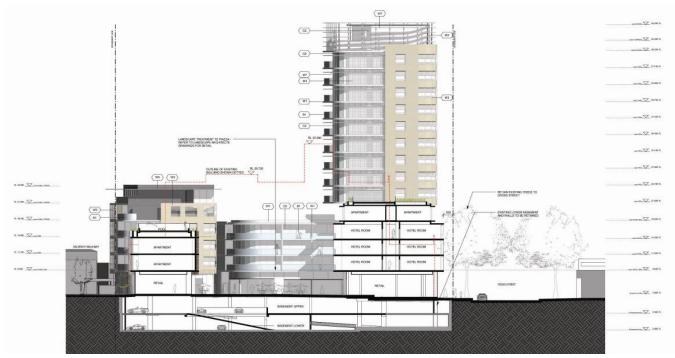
Comparison of existing and proposed building height t 70% of the development is located in the podium element of the building. The five storey tower in the north eastern corner of the site is lower in overall height than the existing building.
